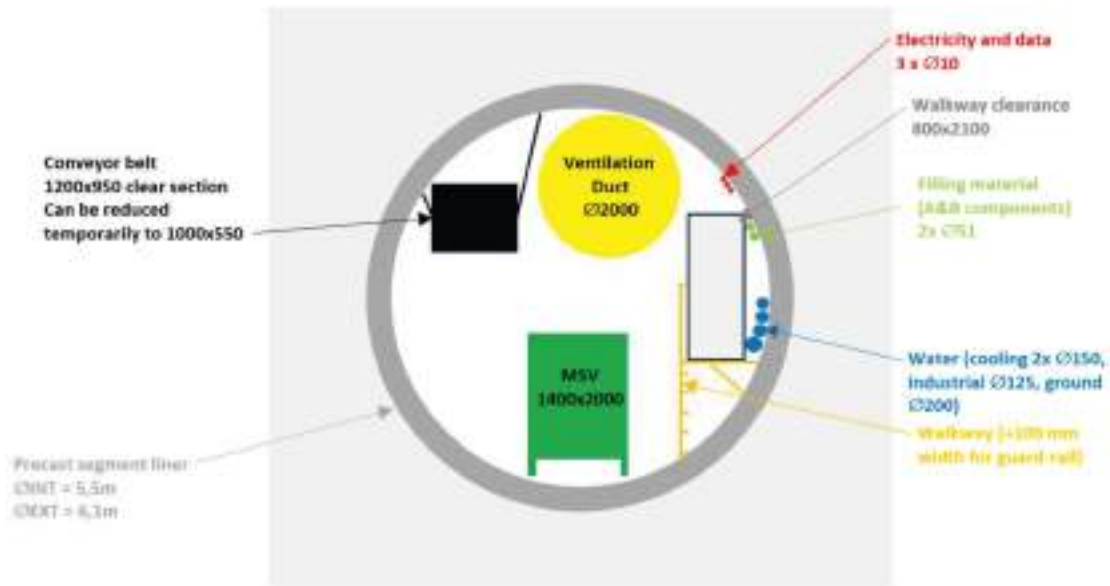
Cross-section of the accelerator tunnel during construction. Credit: Amberg
